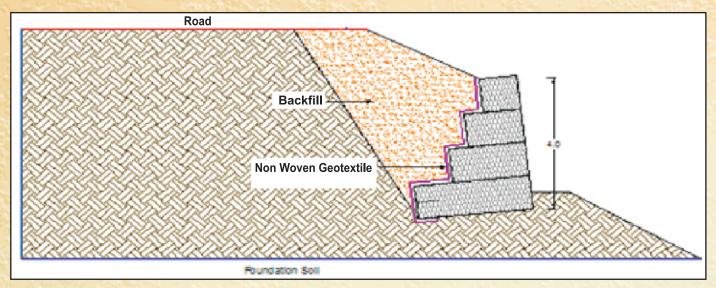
Typical Scheme of Gabion Gravity Retaining wall for road in Valleyside
